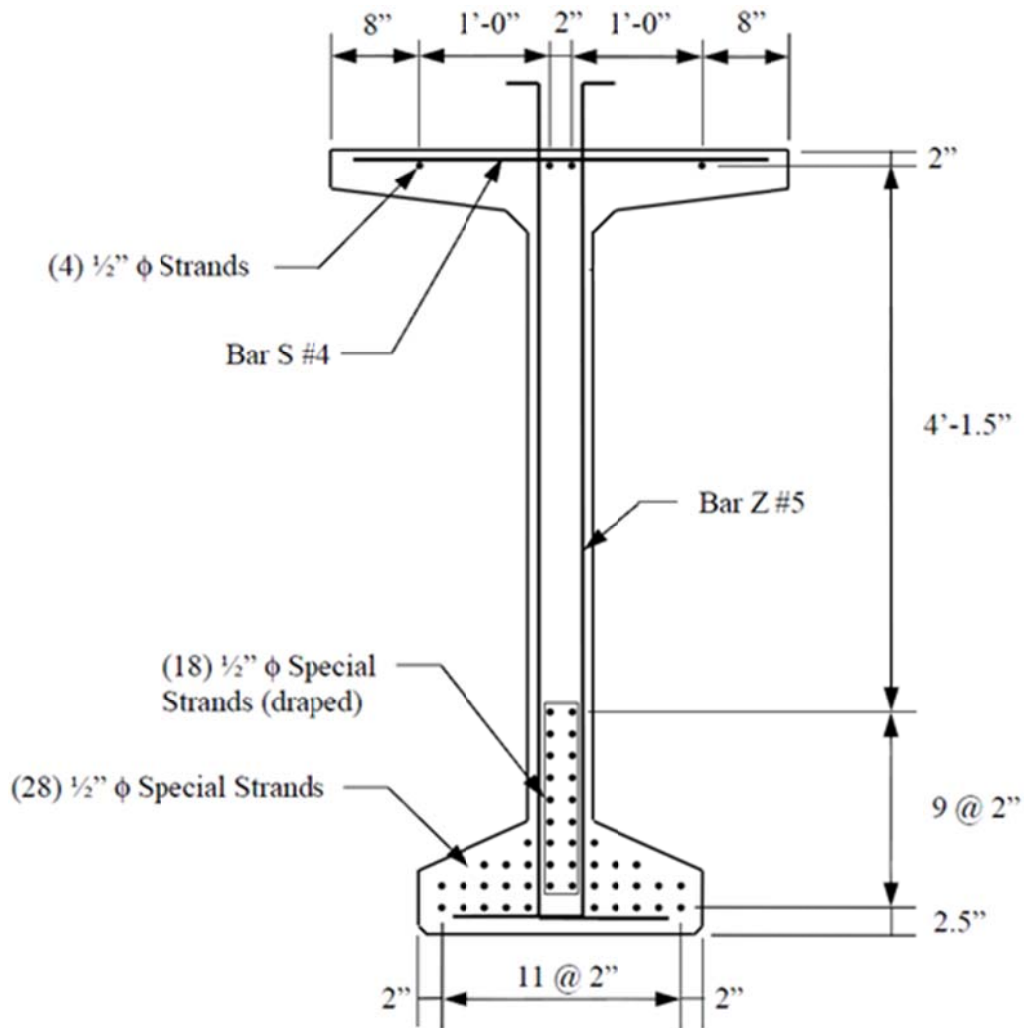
Mild steel and strand arrangement for a BT-72 girder at midspan.
